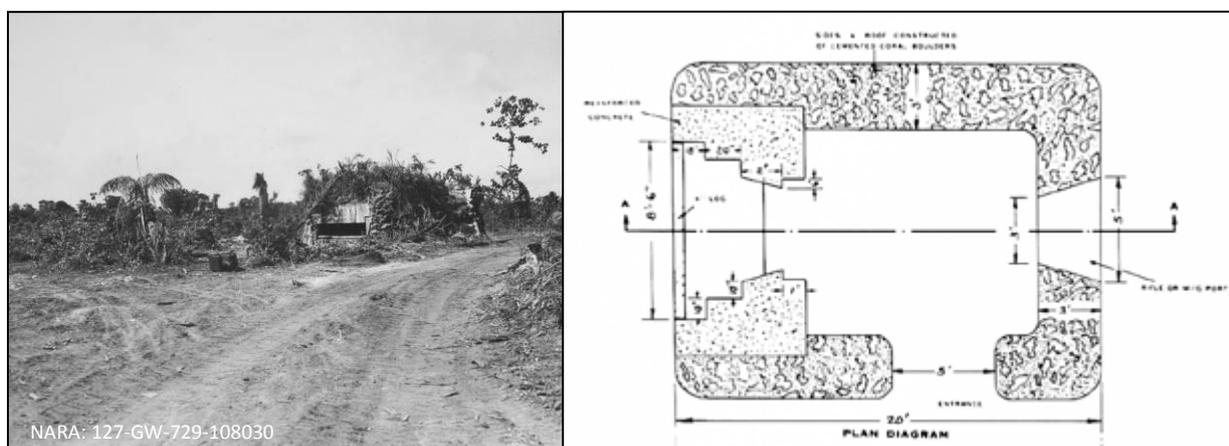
AB14-106: west facing elevation & plan diagram (NARA: 127-306-C1-2), Oct.1944
